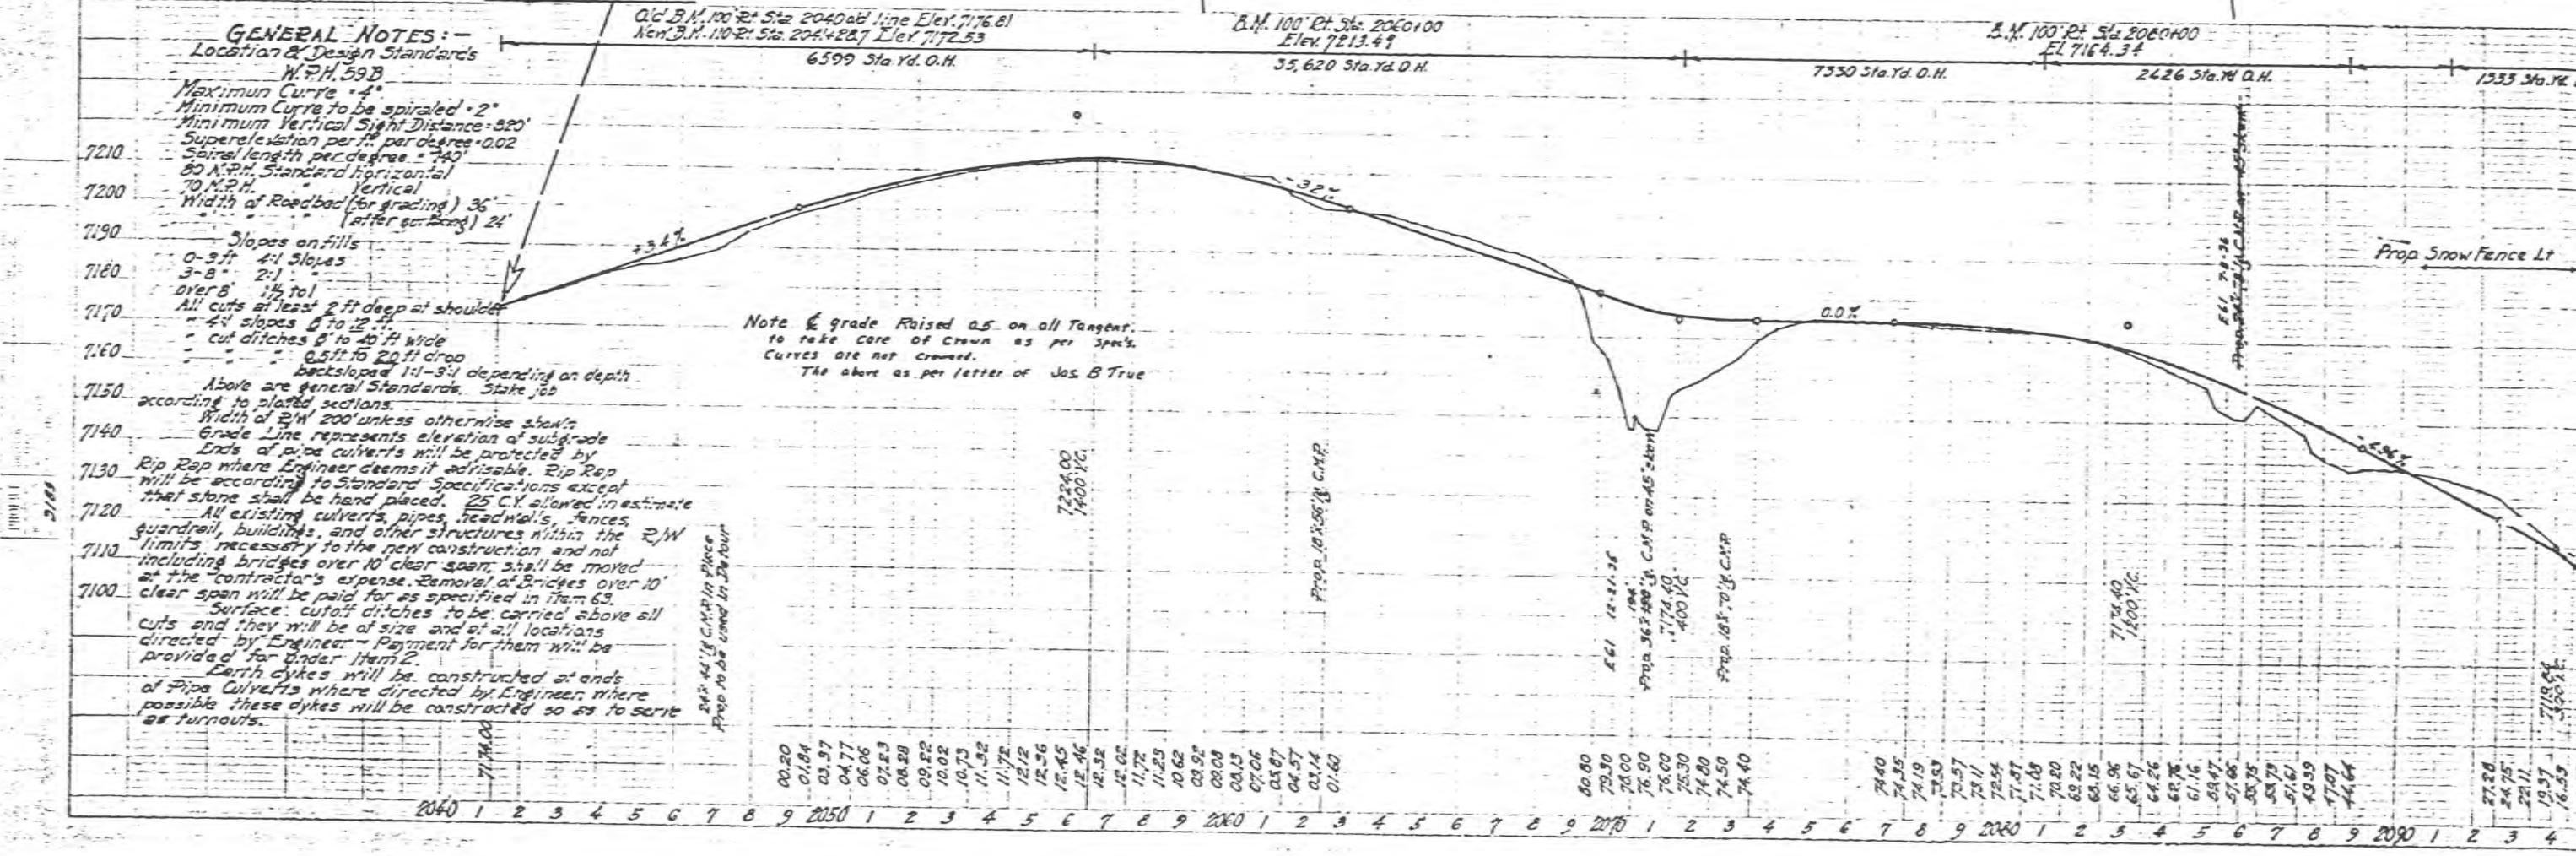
Plan and profile sheet from 1919 to 1922 reconstruction of the Lincoln Highway (Federal Aid Project 36) in Telephone Canyon, Albany County, Wyoming. The plans show cross-sections, plan and profile views, and guardrail specifications.
